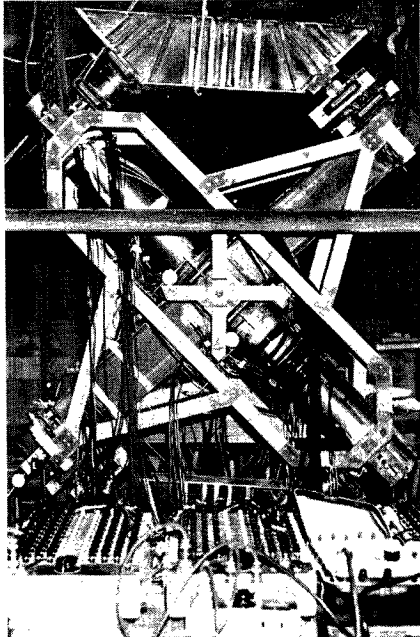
Test set-up for "horizontal load type" testing (PJHM).
